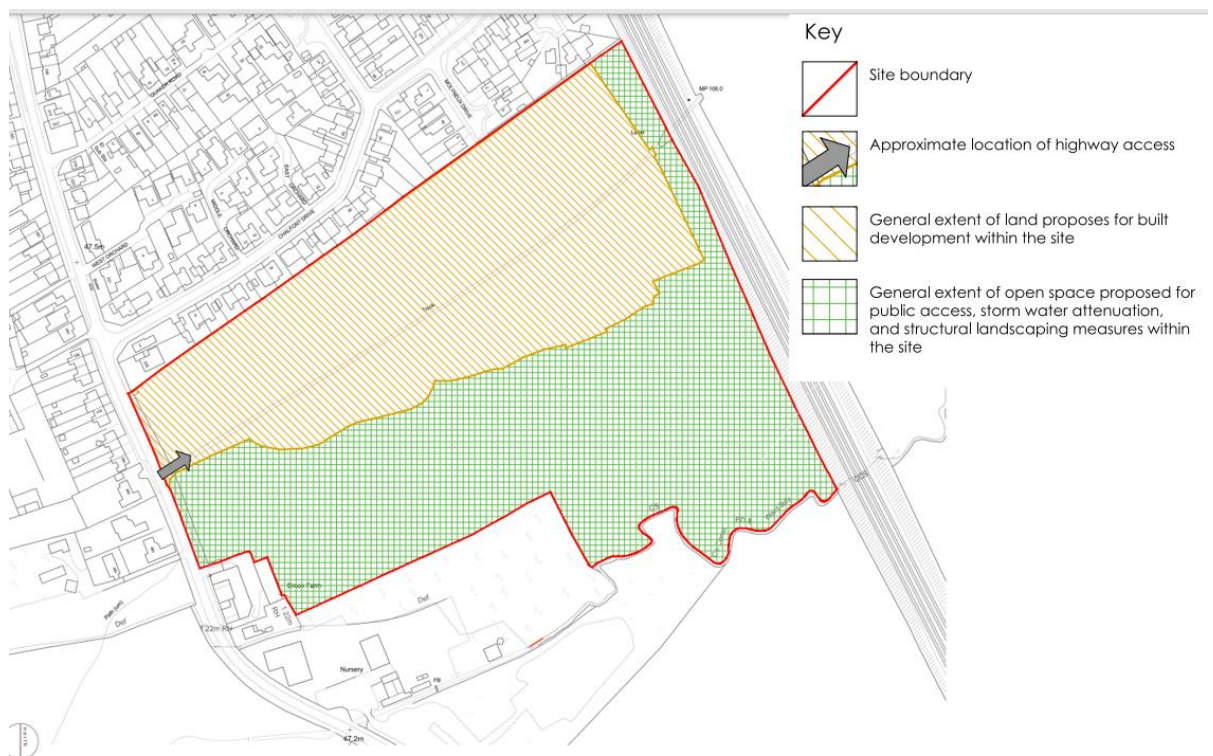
Parameters Plan (Cossington Road, Sileby Inquiry ID9)
